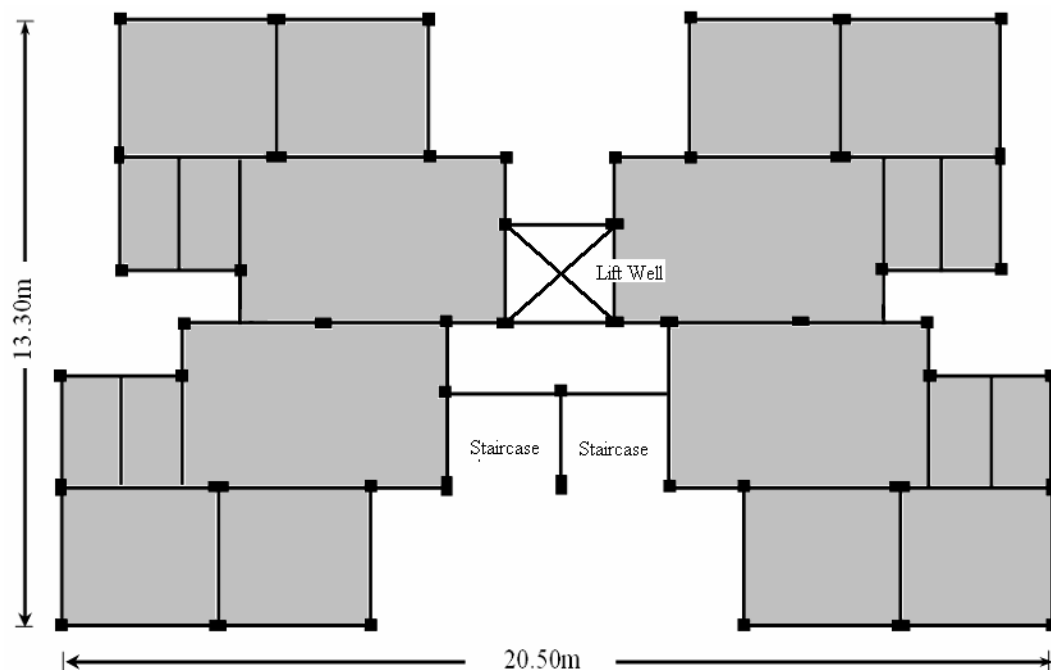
A typical building plan with diaphragm discontinuity and re-entrant corners
